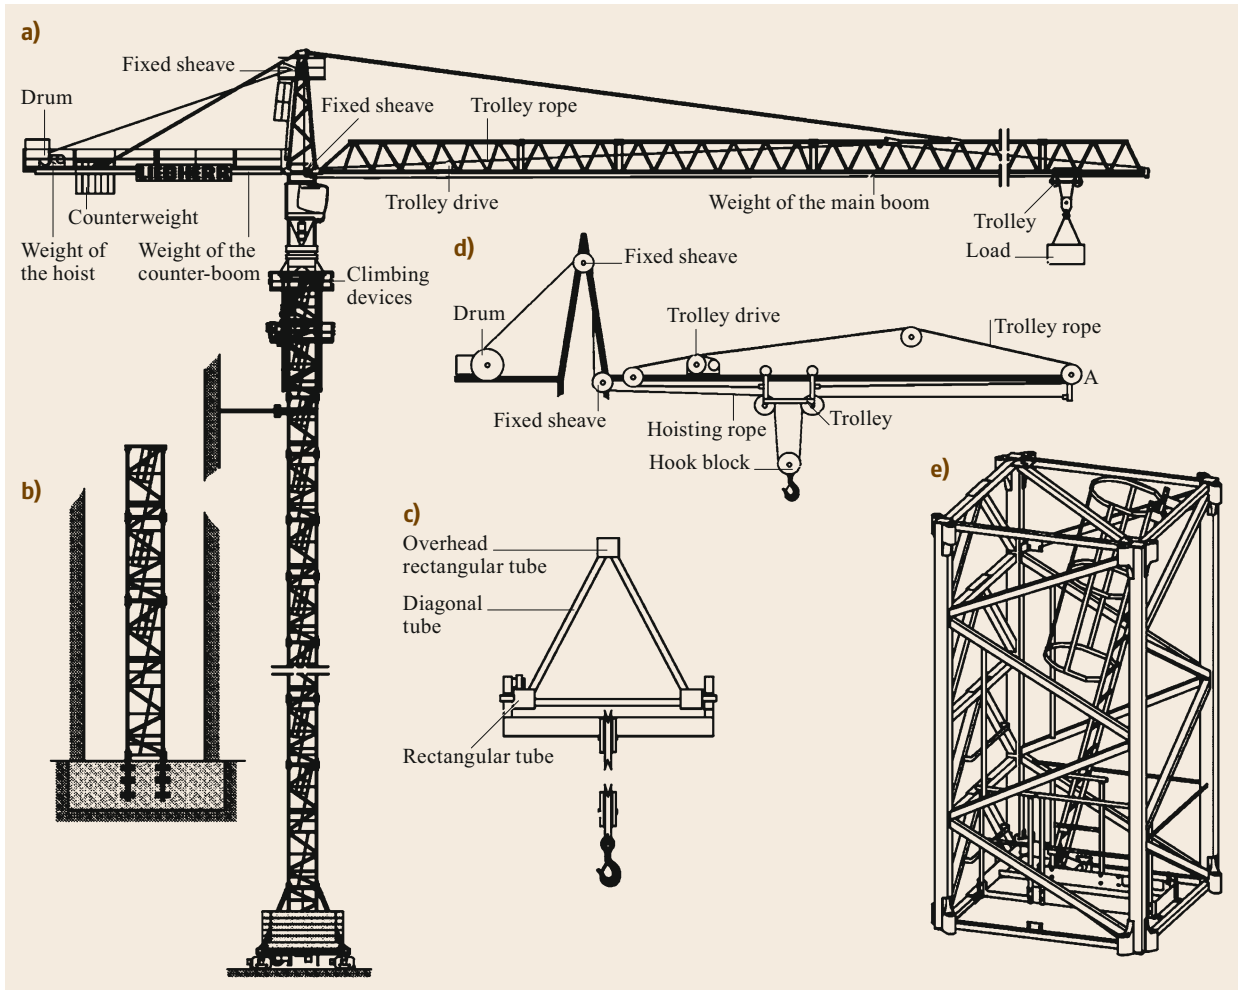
e Top slewing tower crane (Liebherr), (a) trolley jib tower crane, (b) crane tower on foundation anchors, (c) cut view of trolley jib, (d) rope drive of hoisting rope and trolley rope, (e) design of a tower section
